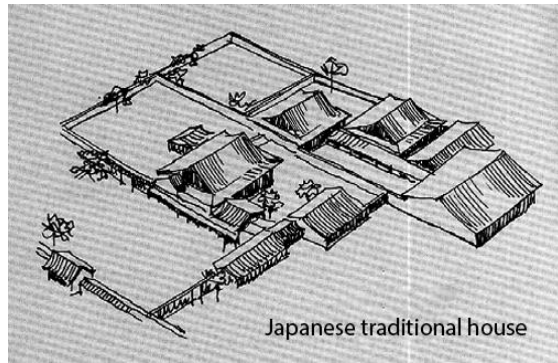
Typical layout of Japanese traditional house (Schoenauer, 1962).
